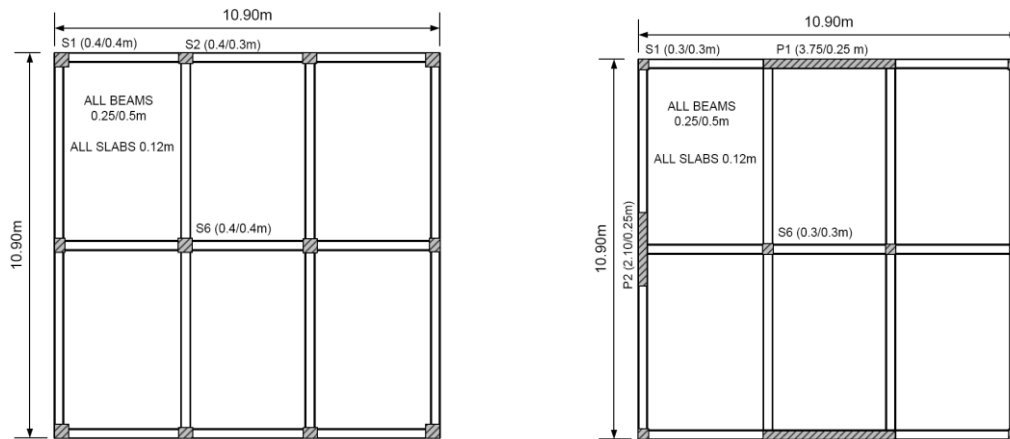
First floor plans of generic 3 storey reinforced concrete frame and dual system buildings
